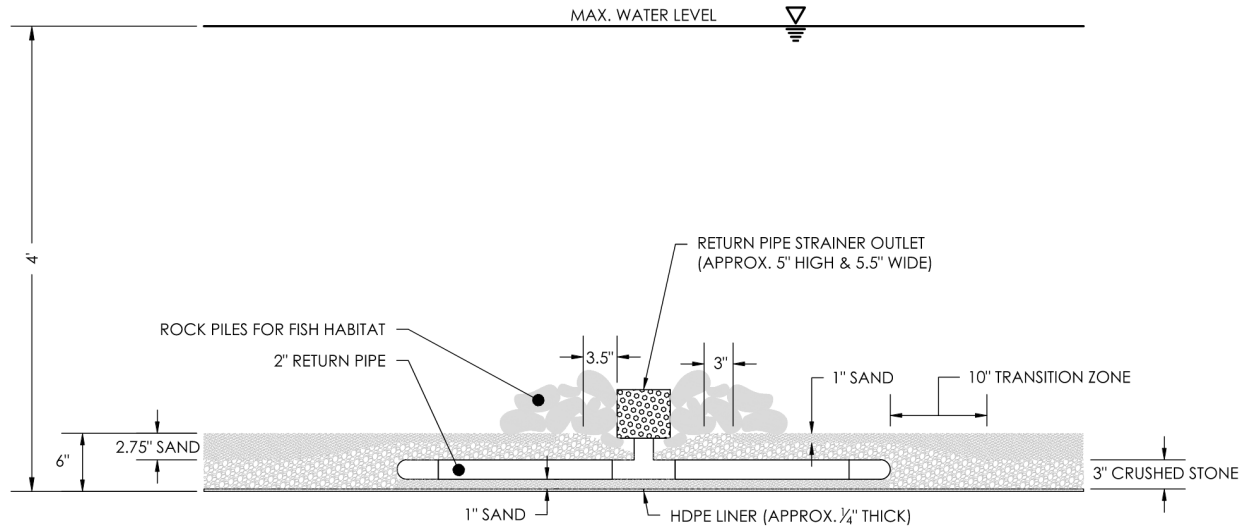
Typical Return Pipe Integration with Rock Pile Section
